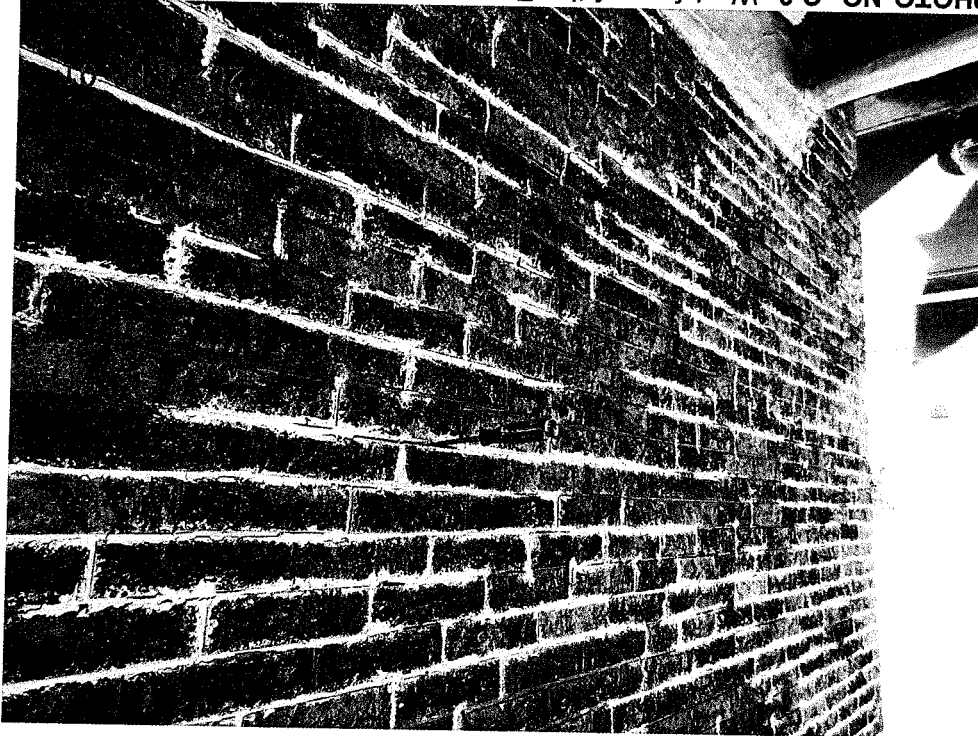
West face of the East Tower. Note: majority of joints filled with white caulk.
